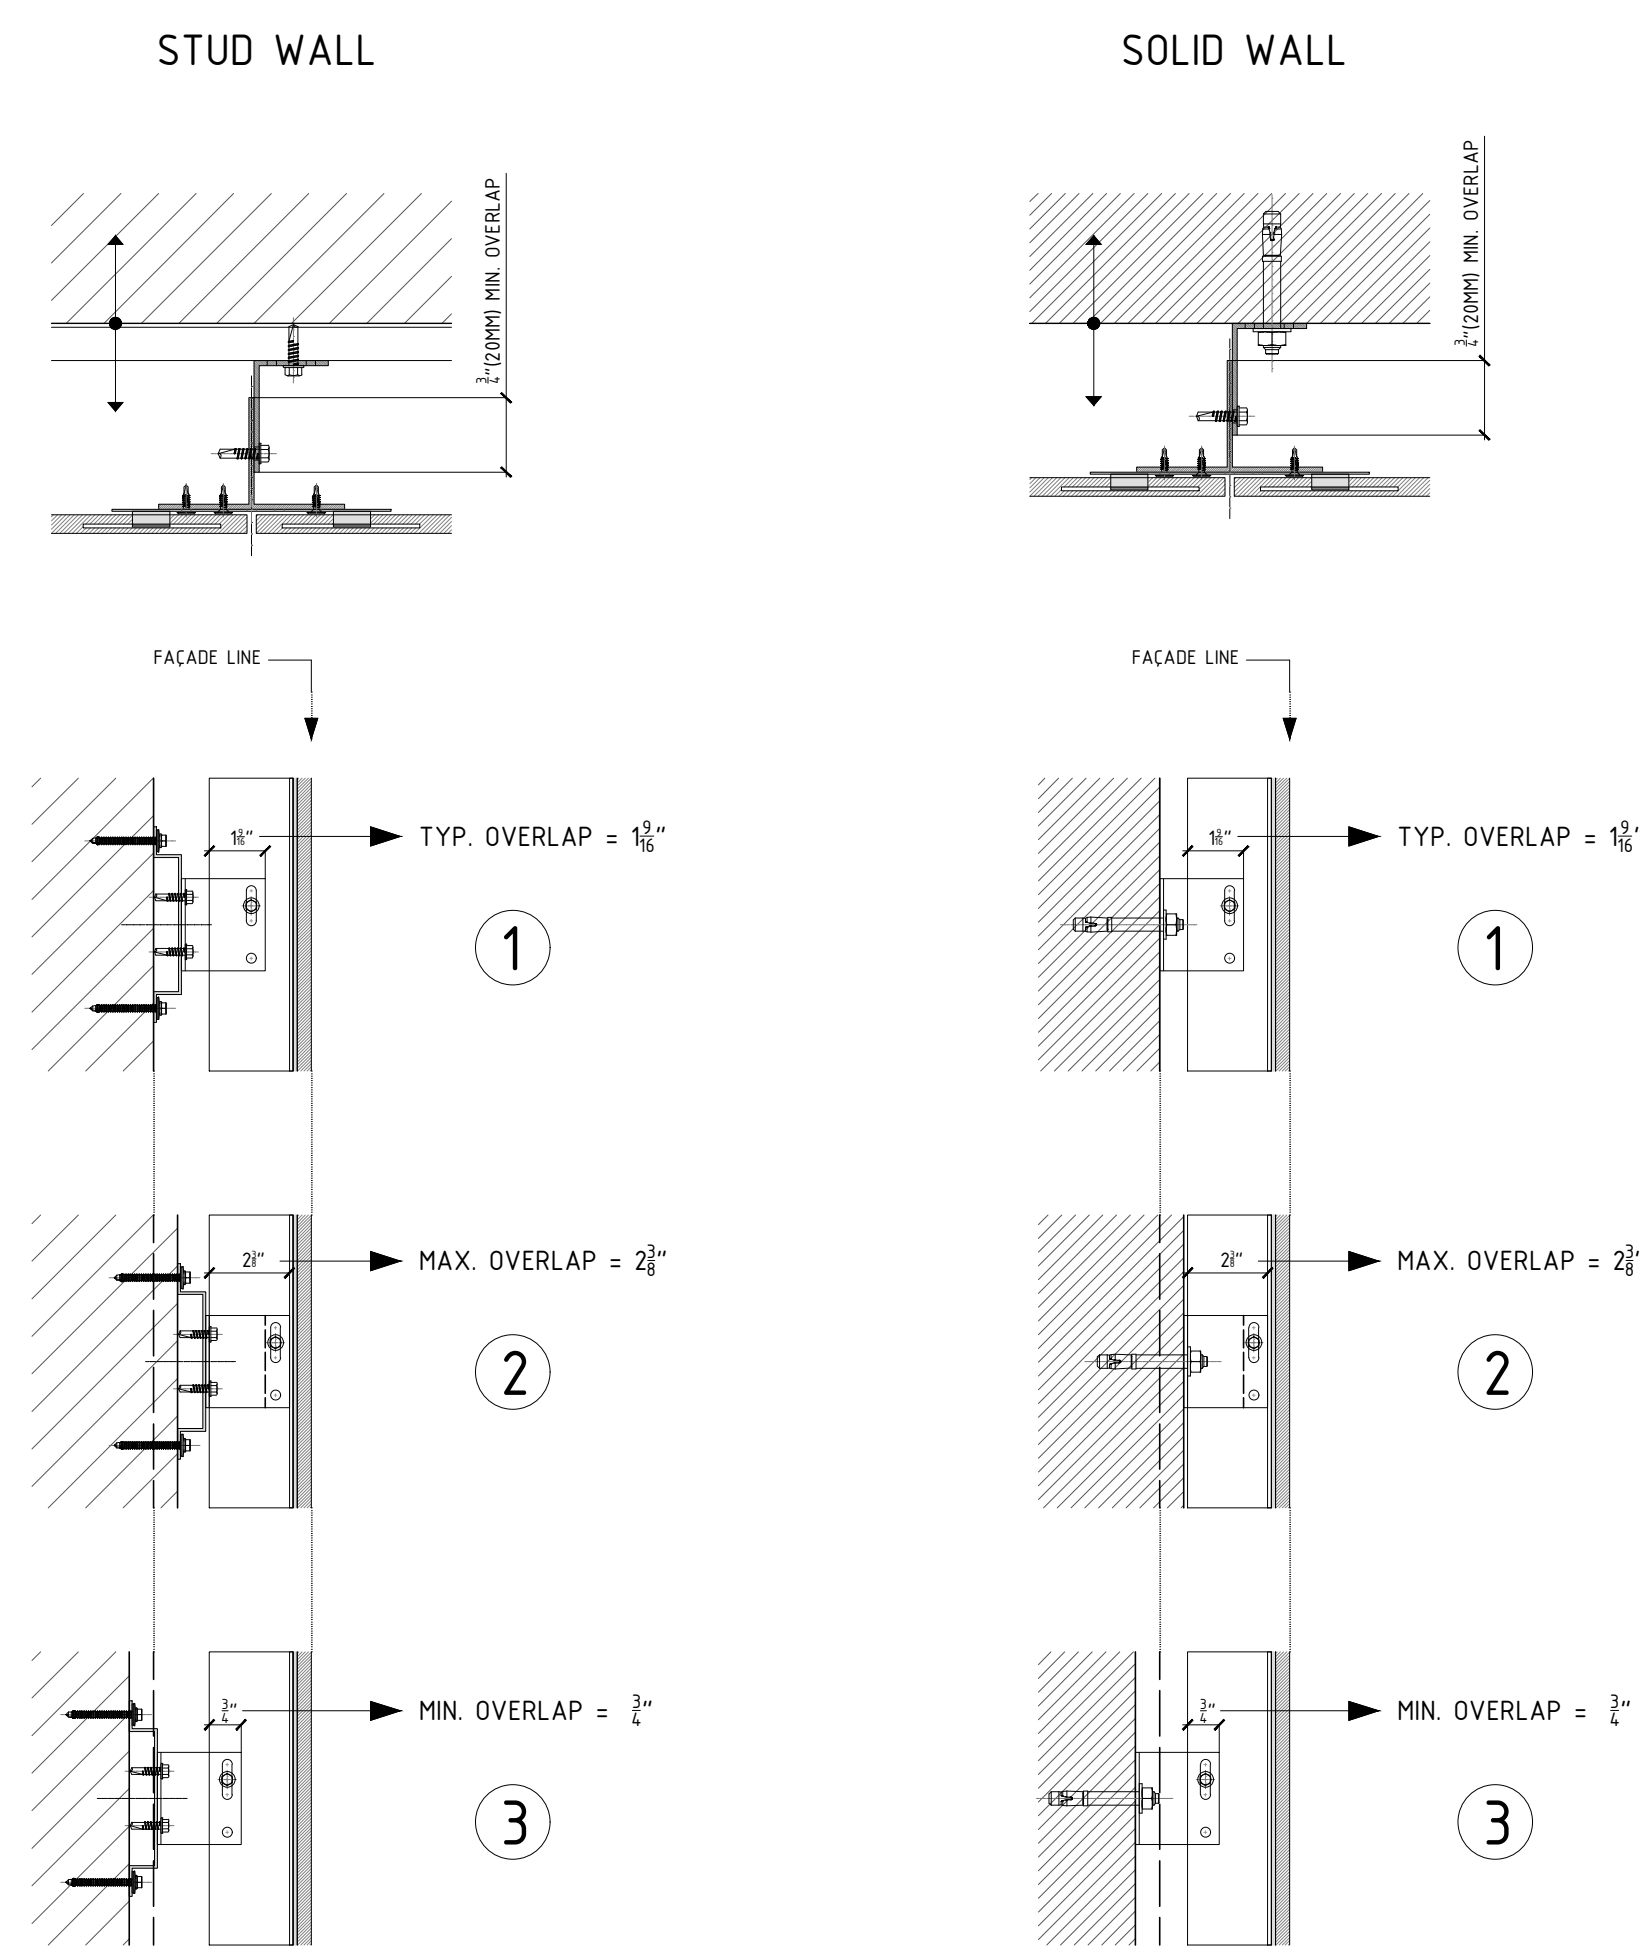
VERTICAL PROFILES TO L-BRACKETS
